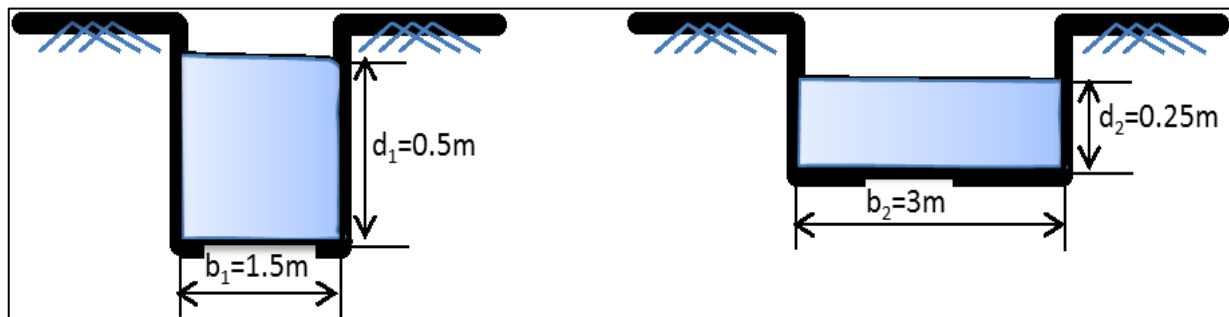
Exercise on best hydraulic section of rectangular canal
